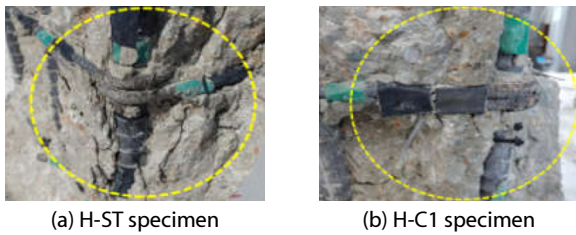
Hoop reinforcement details of high strength concrete specimens at final stage
